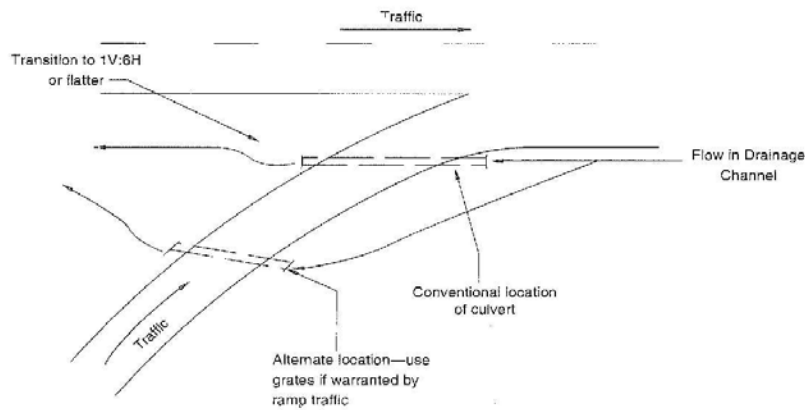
Alternate Location for a Parallel Drainage Culvert
